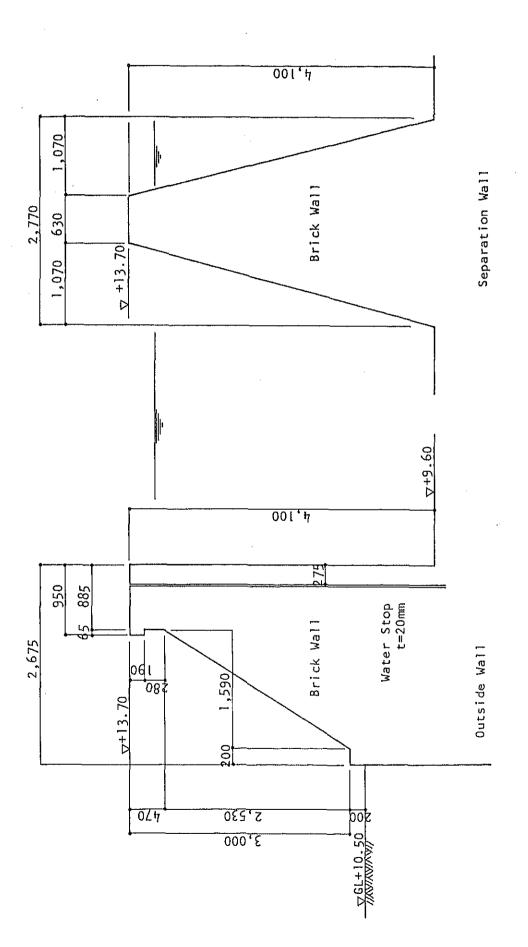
EXISTING WALL OF SEDIMENTATION BASIN (Zagazig Increase)
